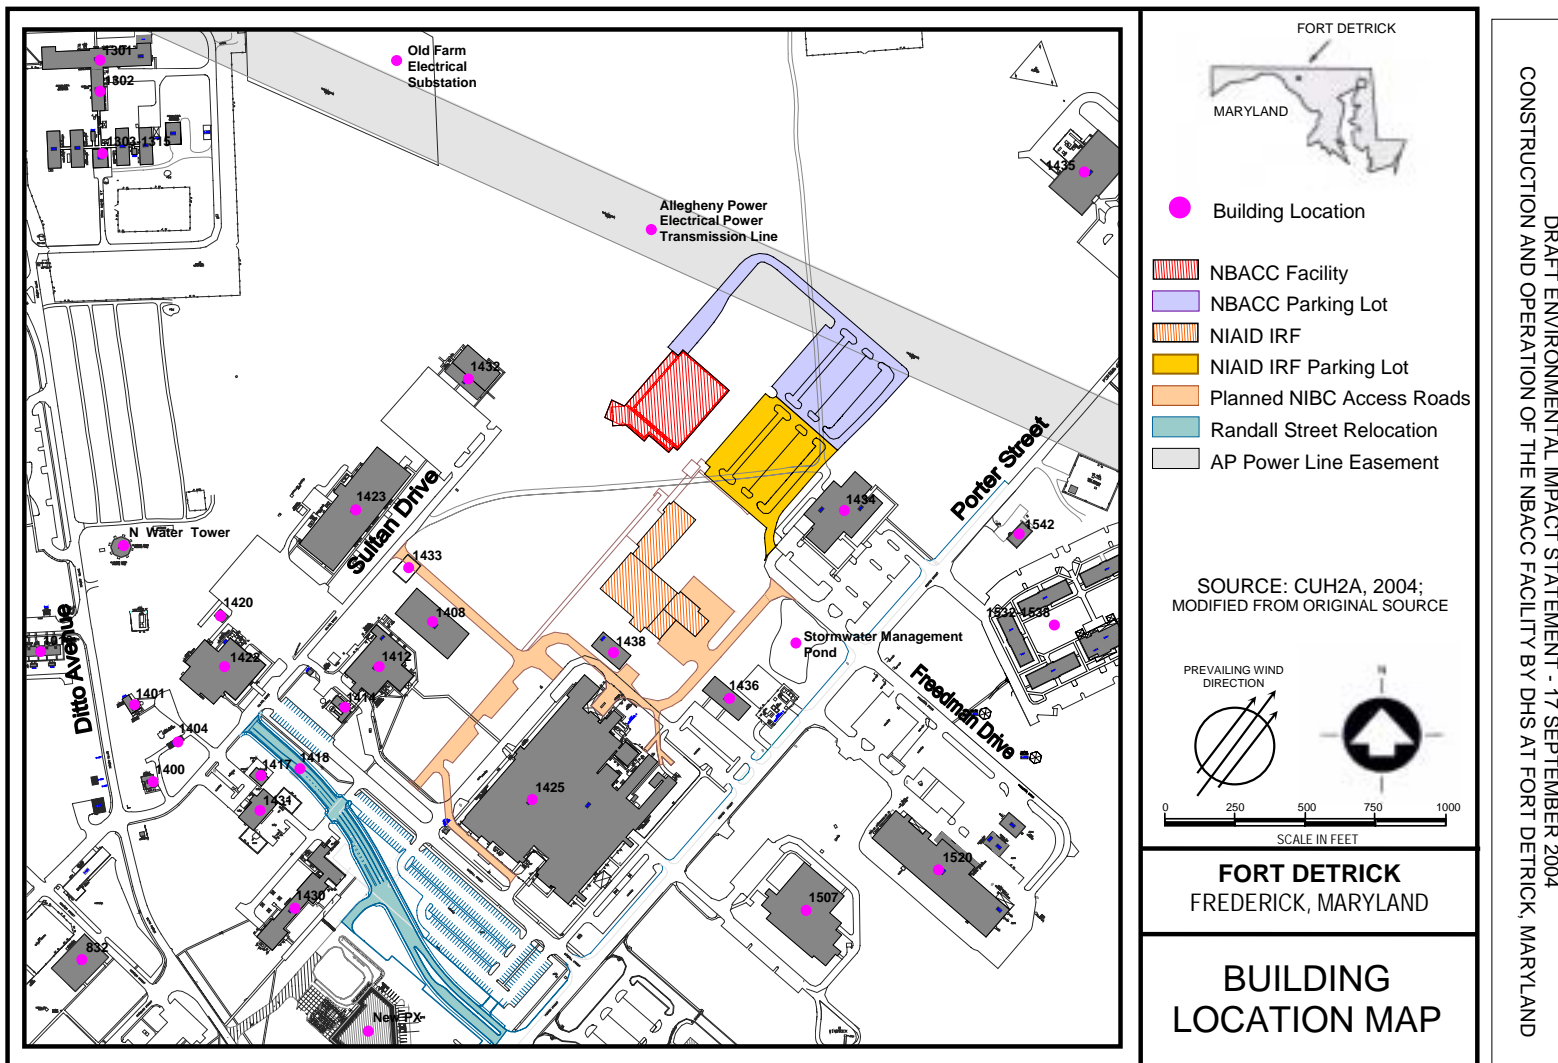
Building Locations of the Proposed NBACC Facility Site.
